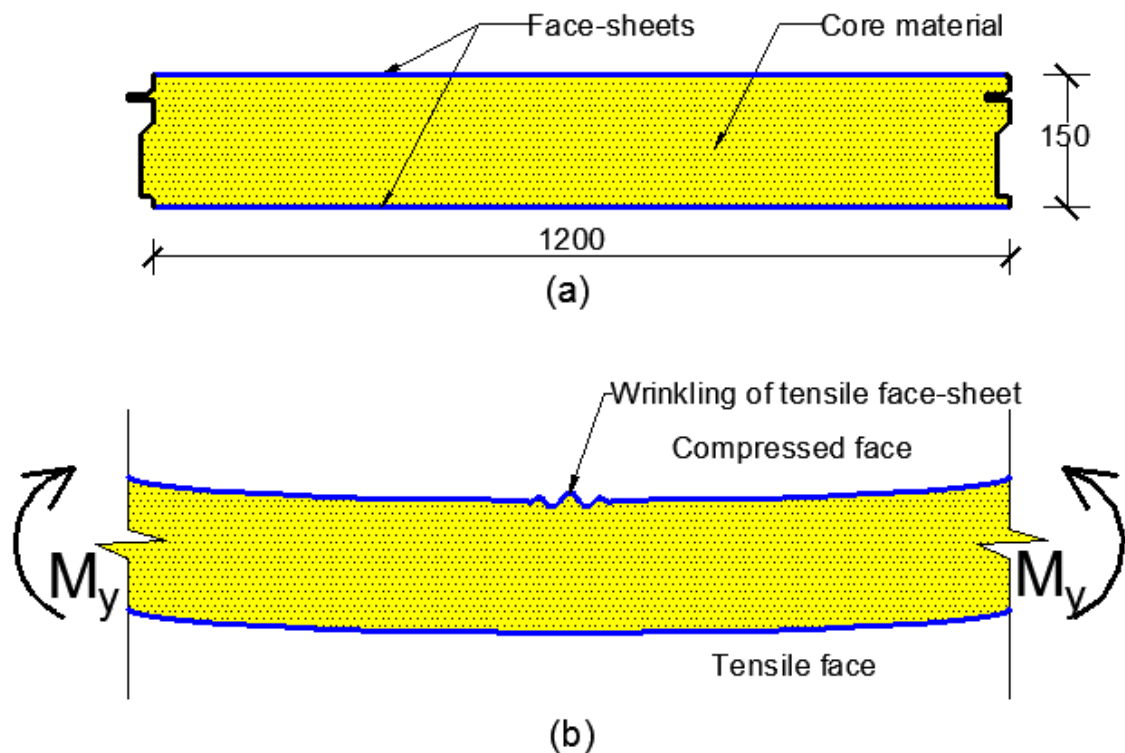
(a) Sandwich panel cross-section; (b) wrinkling of compressed face in sandwich panel side view
